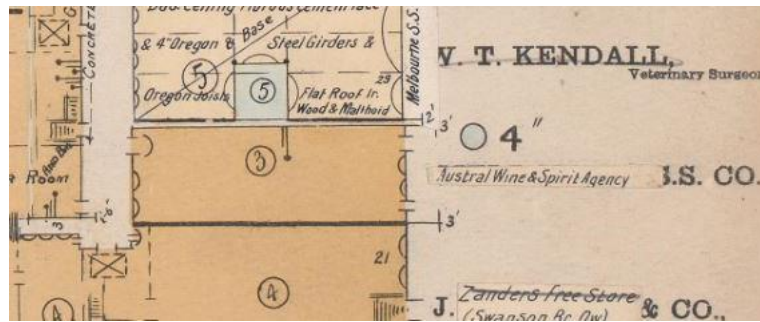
Detail from 1910 Mahlsted plan shows the current building on the subject site. In 1910 25 King Street was still occupied by the Melbourne Shipping Co., despite a tab for 'Austral Wine & Spirit Agency' blocking out the business name on the above plan. (Mahlsted Map, no 24, 1910)
